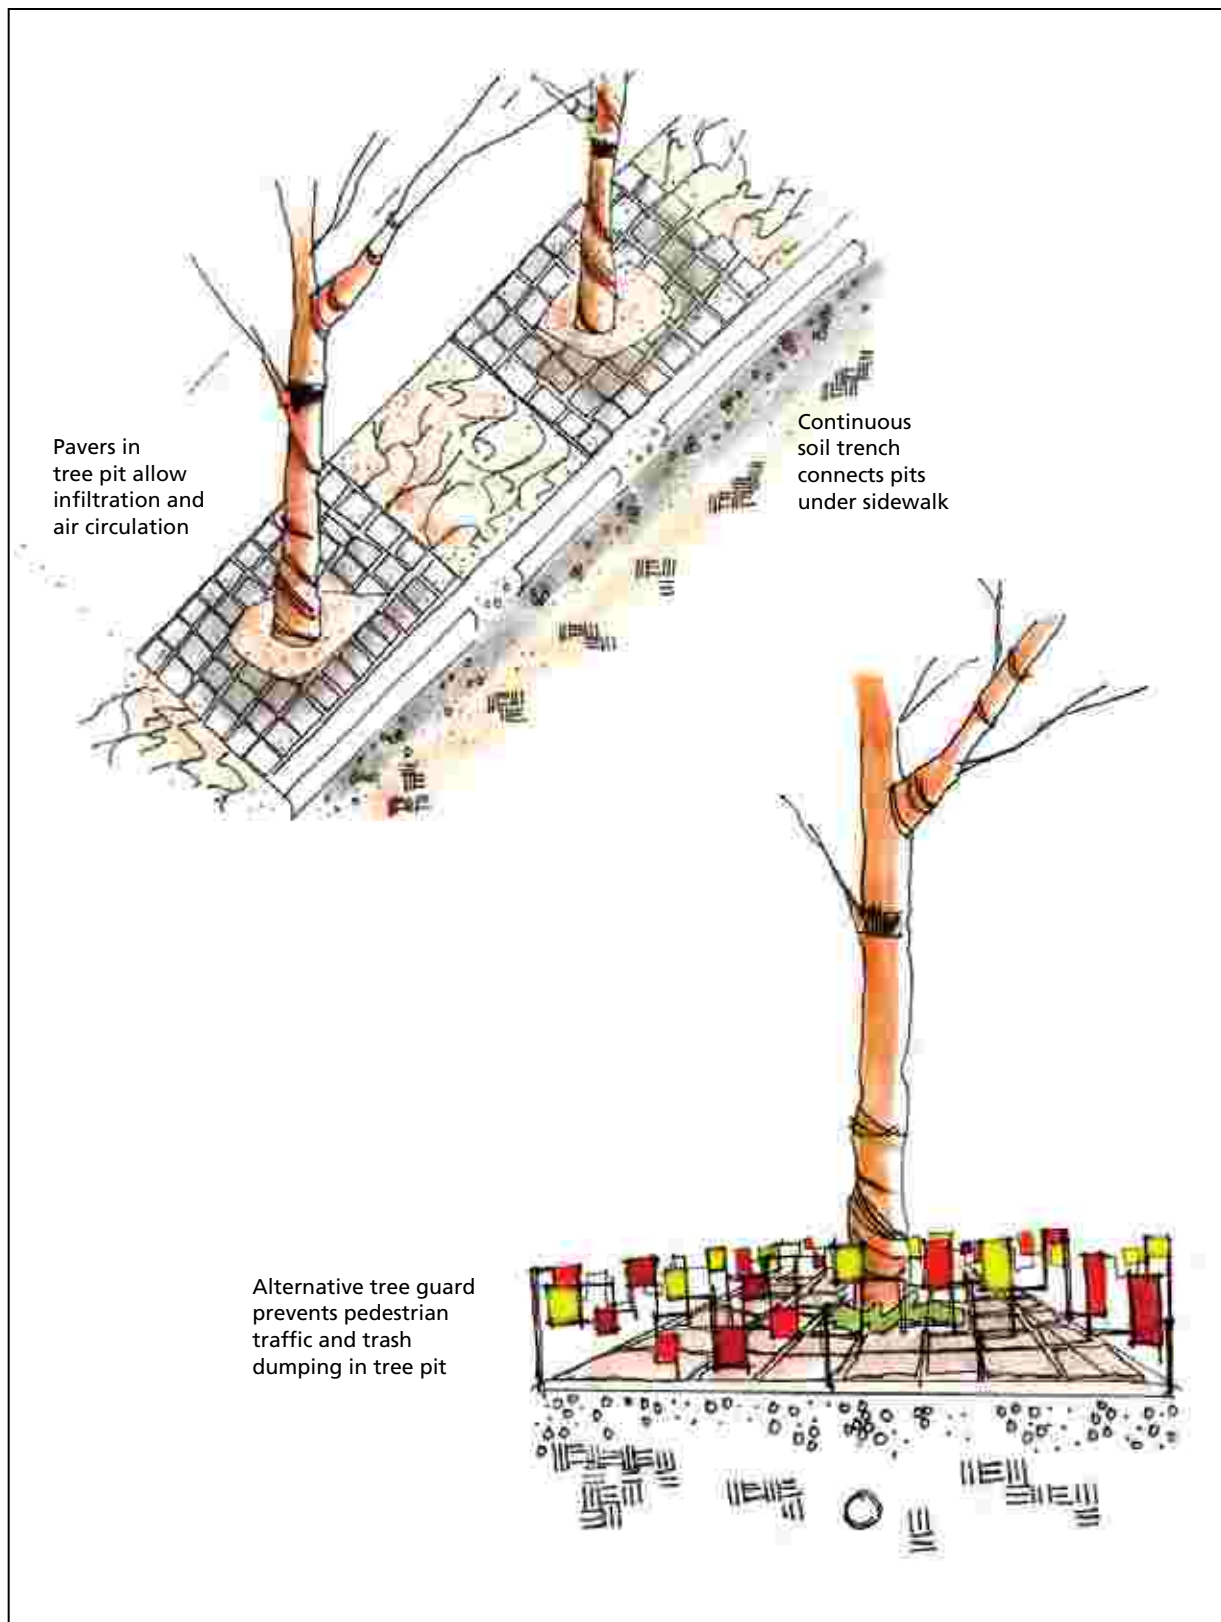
Tree pits are connected through a soil trench, and tree pit protection prevents damage from pedestrian traffic.
